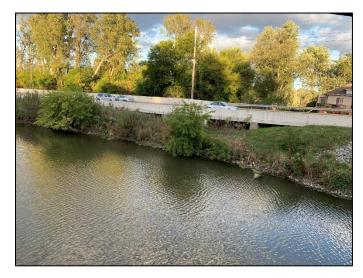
US 6/SR 51 Bridge west side from covered walking bridge with Deep River, viewing northeast, 9/30/2020
